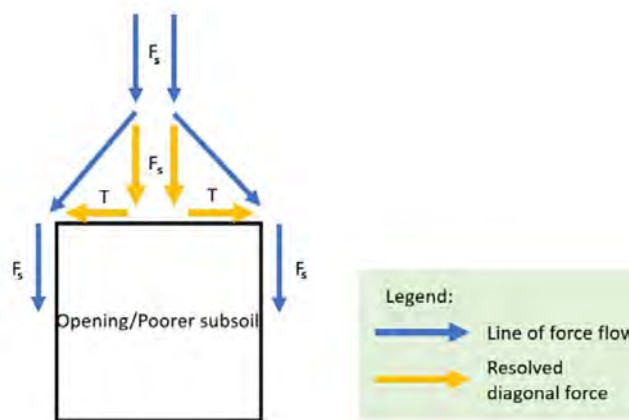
Schematic diagram of tensile force build-up above opening and poorer subsoil
